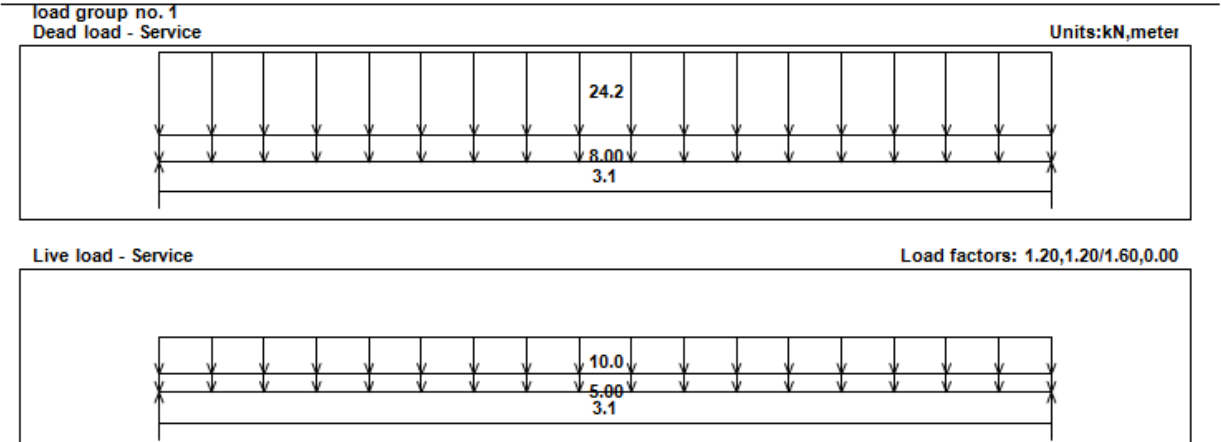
Static System and Loads Distribution At First 1m Of Landing
